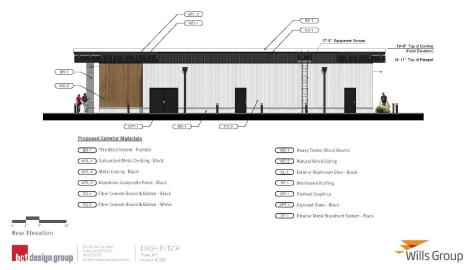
Rear Elevation (Facing West) of the Food or Beverage Store
